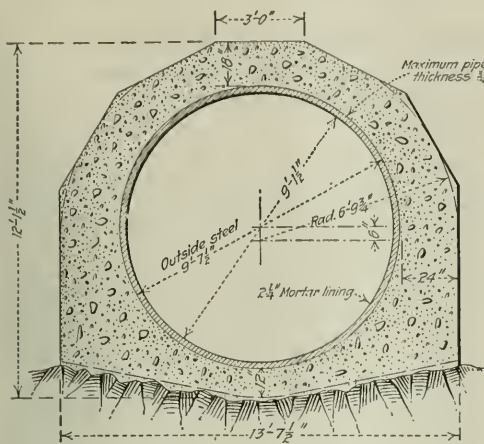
SECTION OF COVERING AND LINING OF PIPE
